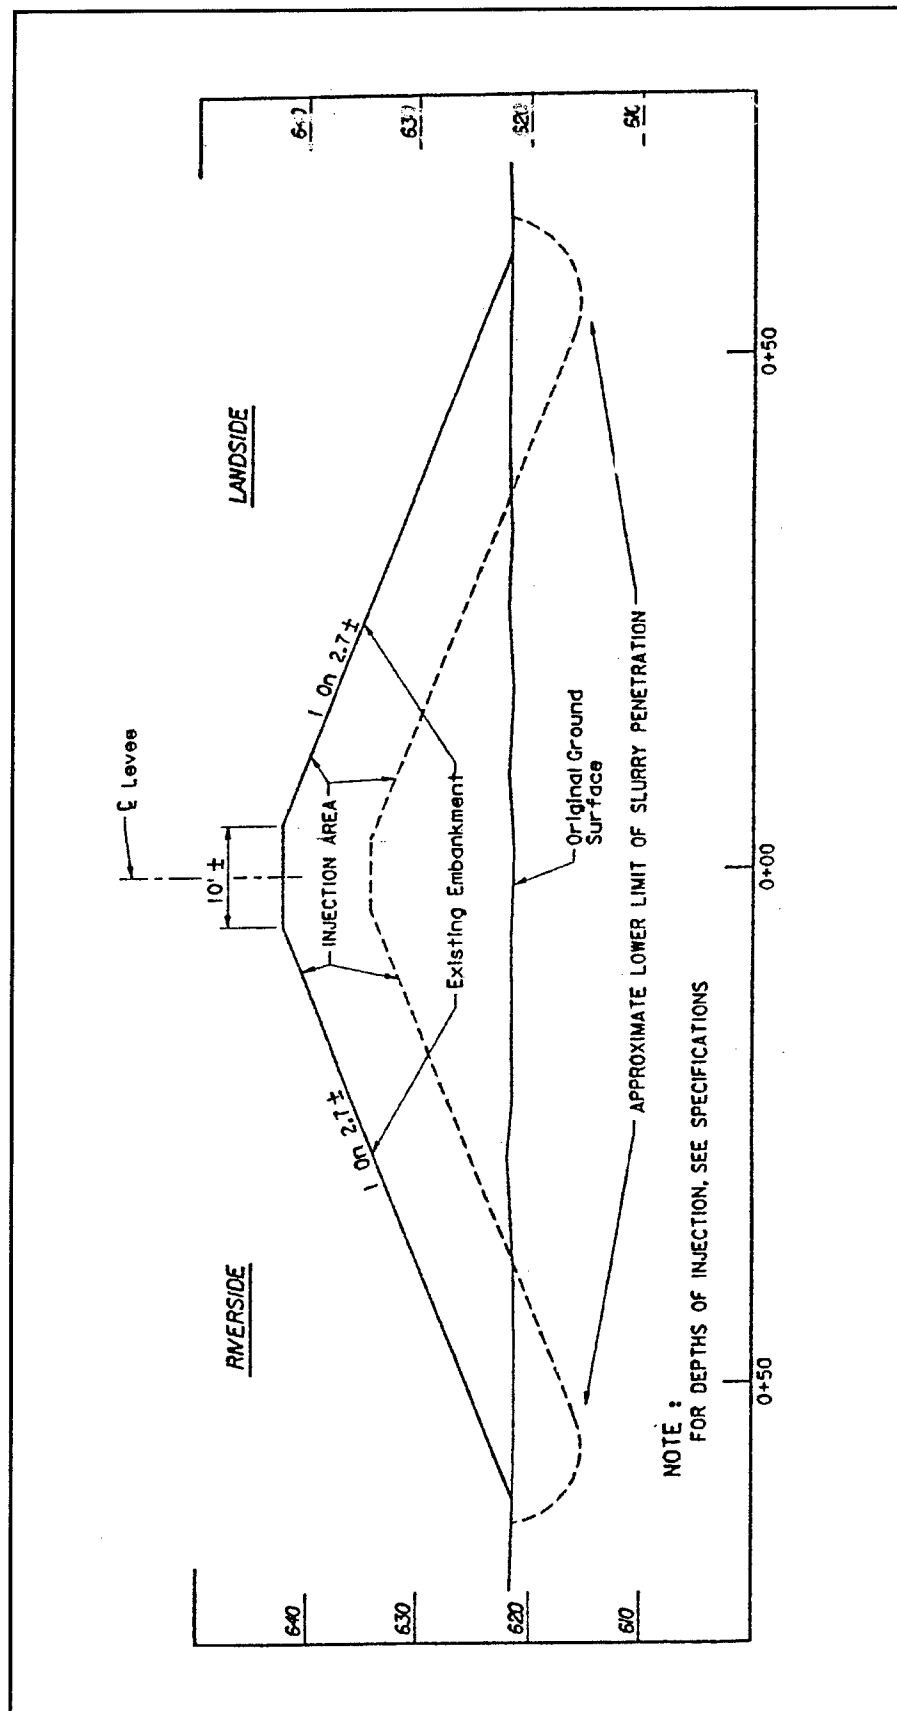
Plan view of levee showing lime-fly ash slurry injection section (after Pengelly and Holloway 1993)
